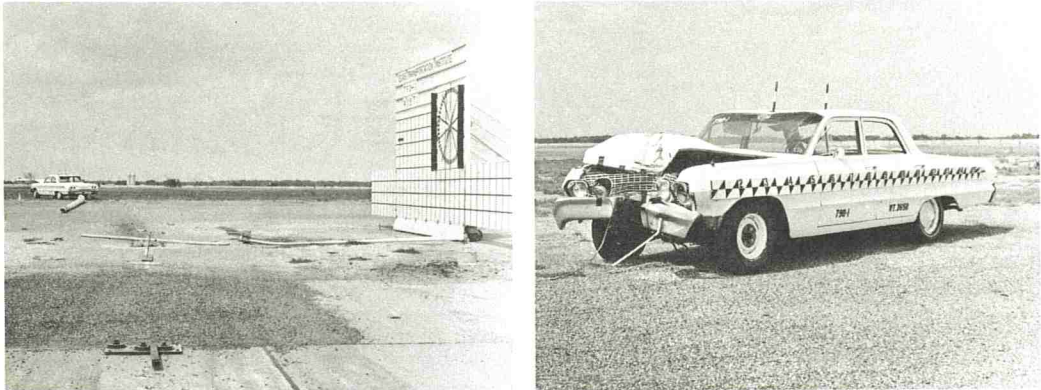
Final position of and damage to luminaire support, Test LS-8.
